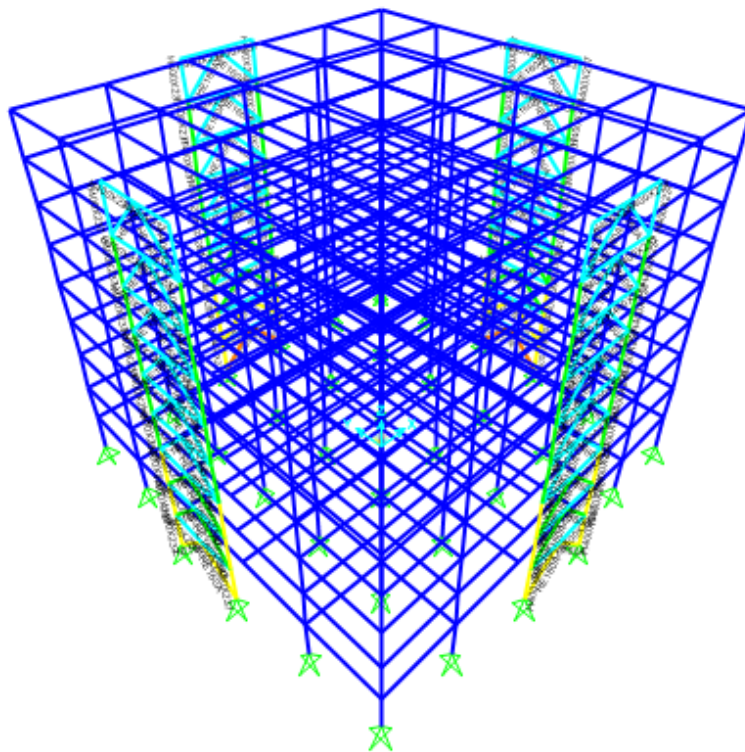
Design Results of Inverted V-Type Bracing System for 9-Story Strengthened Building Model
